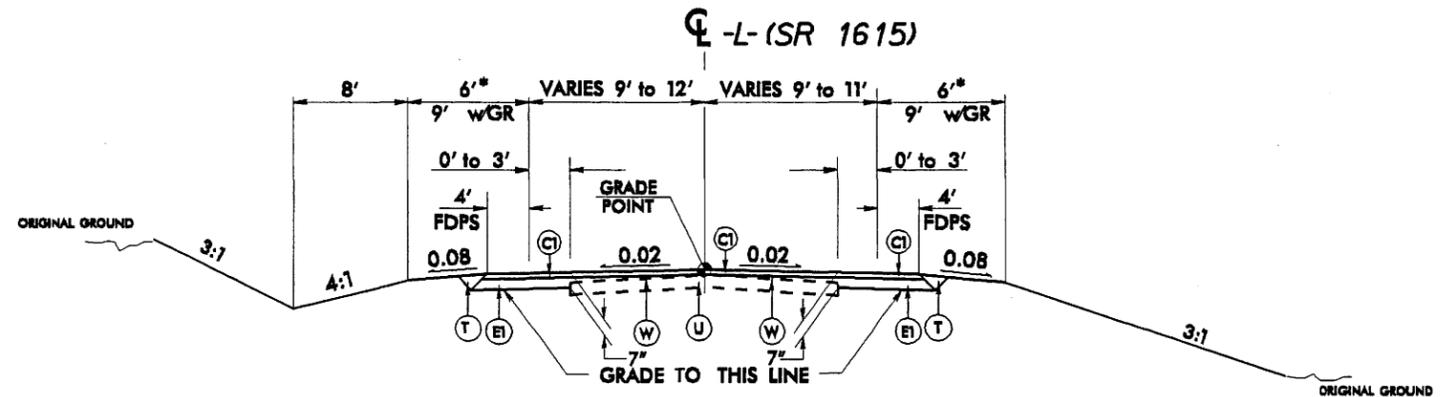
DETAIL SHOWING PAVED SHOULDER IN RELATION TO GUARDRAIL
